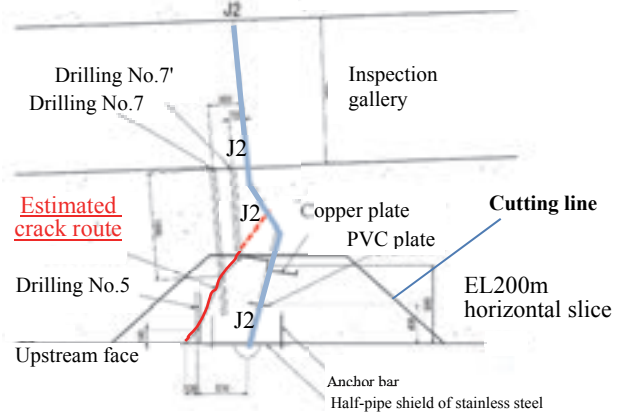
Crack survey plan by drilling near the J2 at EL200m
